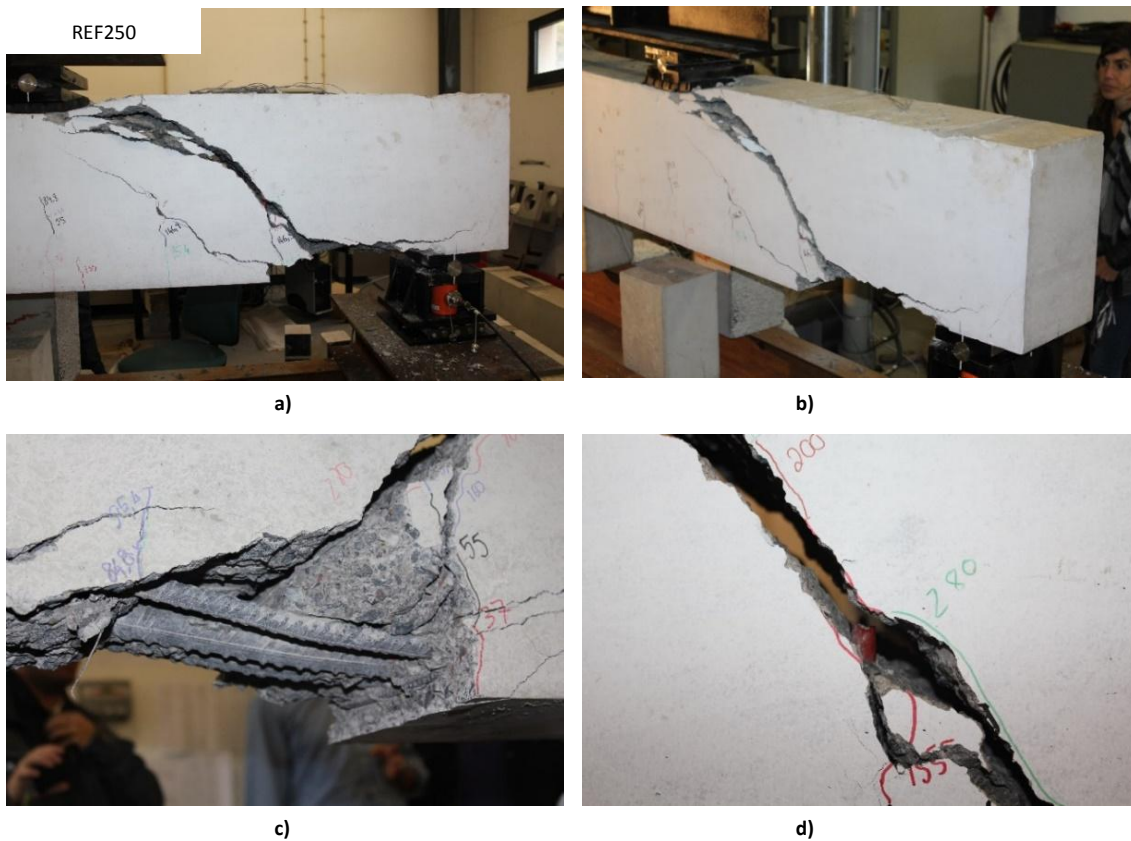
REF250 beam failure: a) front view of the support; b) overall view of the failure; c) bottom reinforcement; d) broken stirrup
